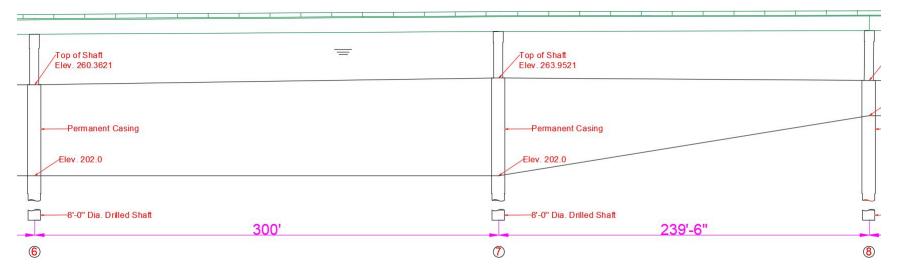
780 ft long continuous welded plate girder span in a long view
